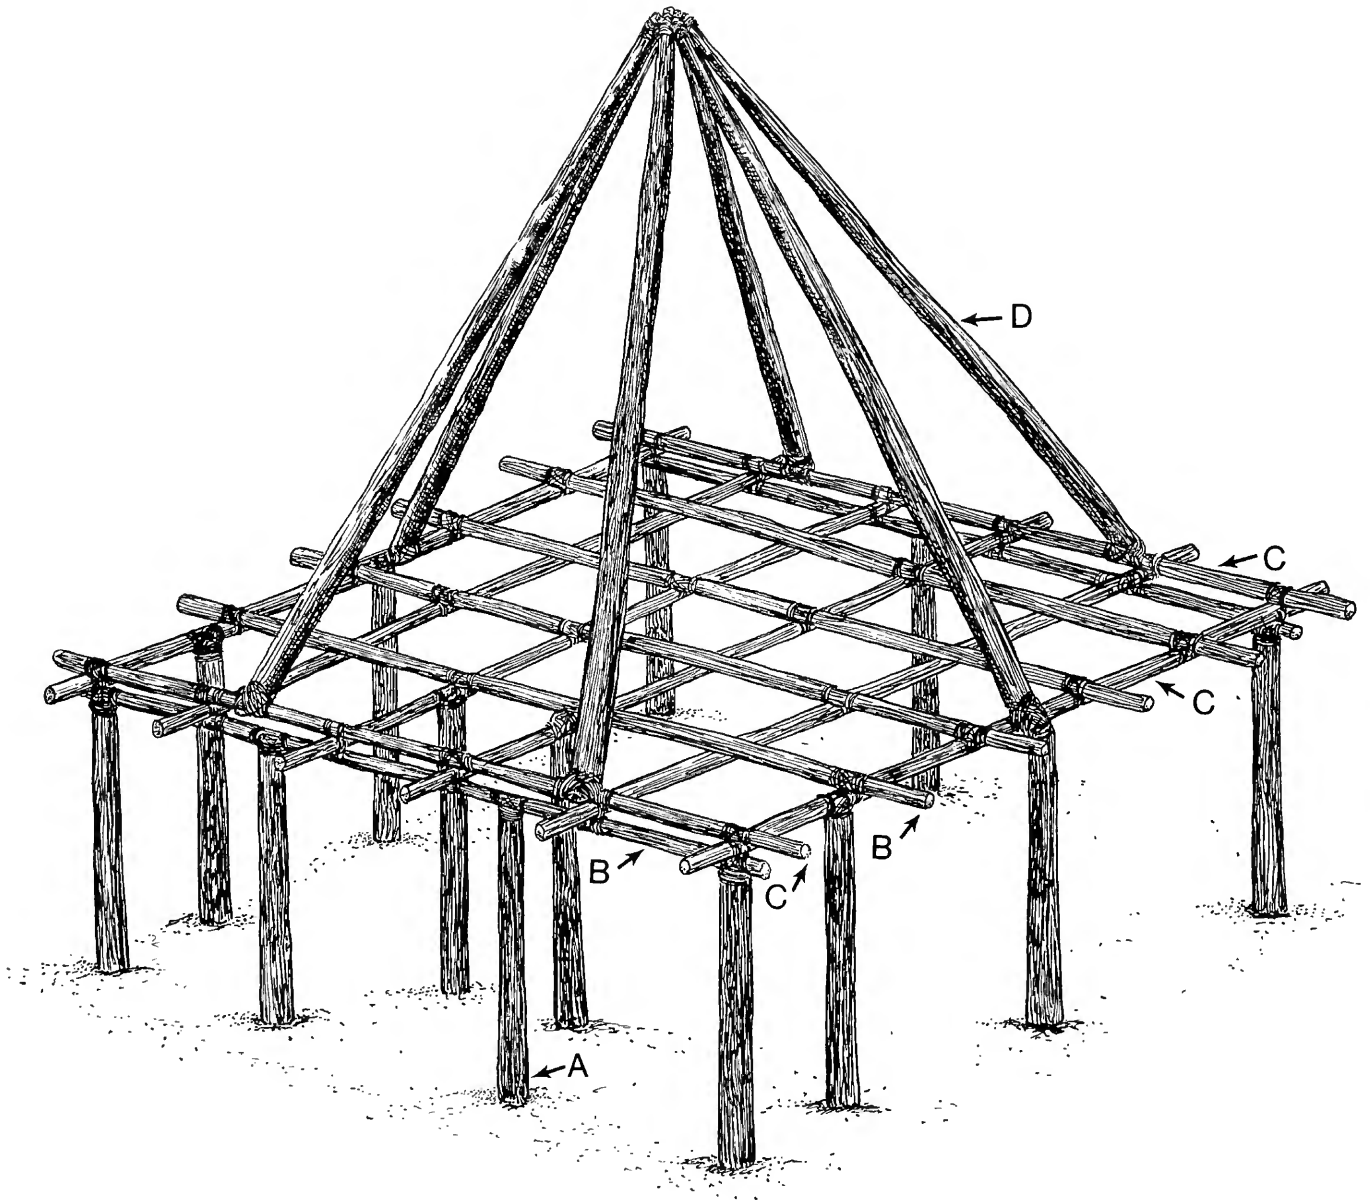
Elevation of house frame: A, posts, *yoyal na*; B, tie beam, *tz'am te'*; C, roof beam plate, *chotleb chuk*; D, main roof beam, *chuk*. Posts delineate a front porch area.
